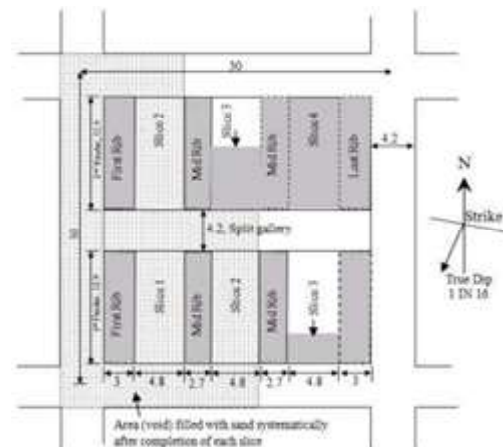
Proposed manner of pillar (30 m x 30 m, centre to centre) extraction in conjunction with sand stowing.
